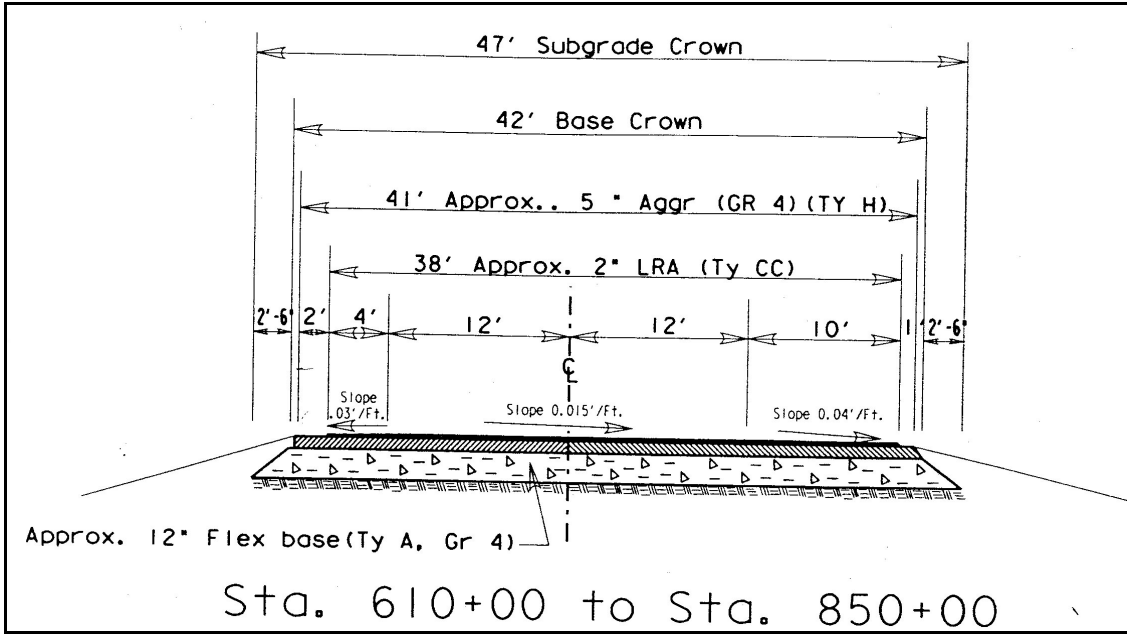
Existing North Typical Section of IH 35 in Laredo District.
